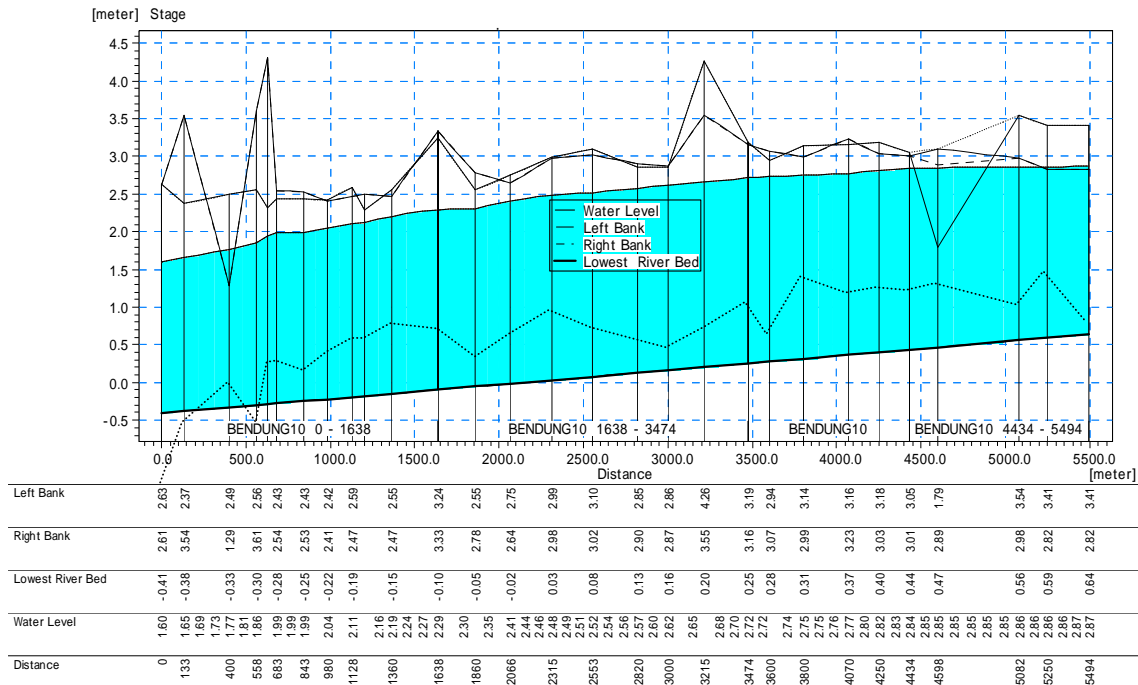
Proposed Profile for Bendung Channel Improvement
